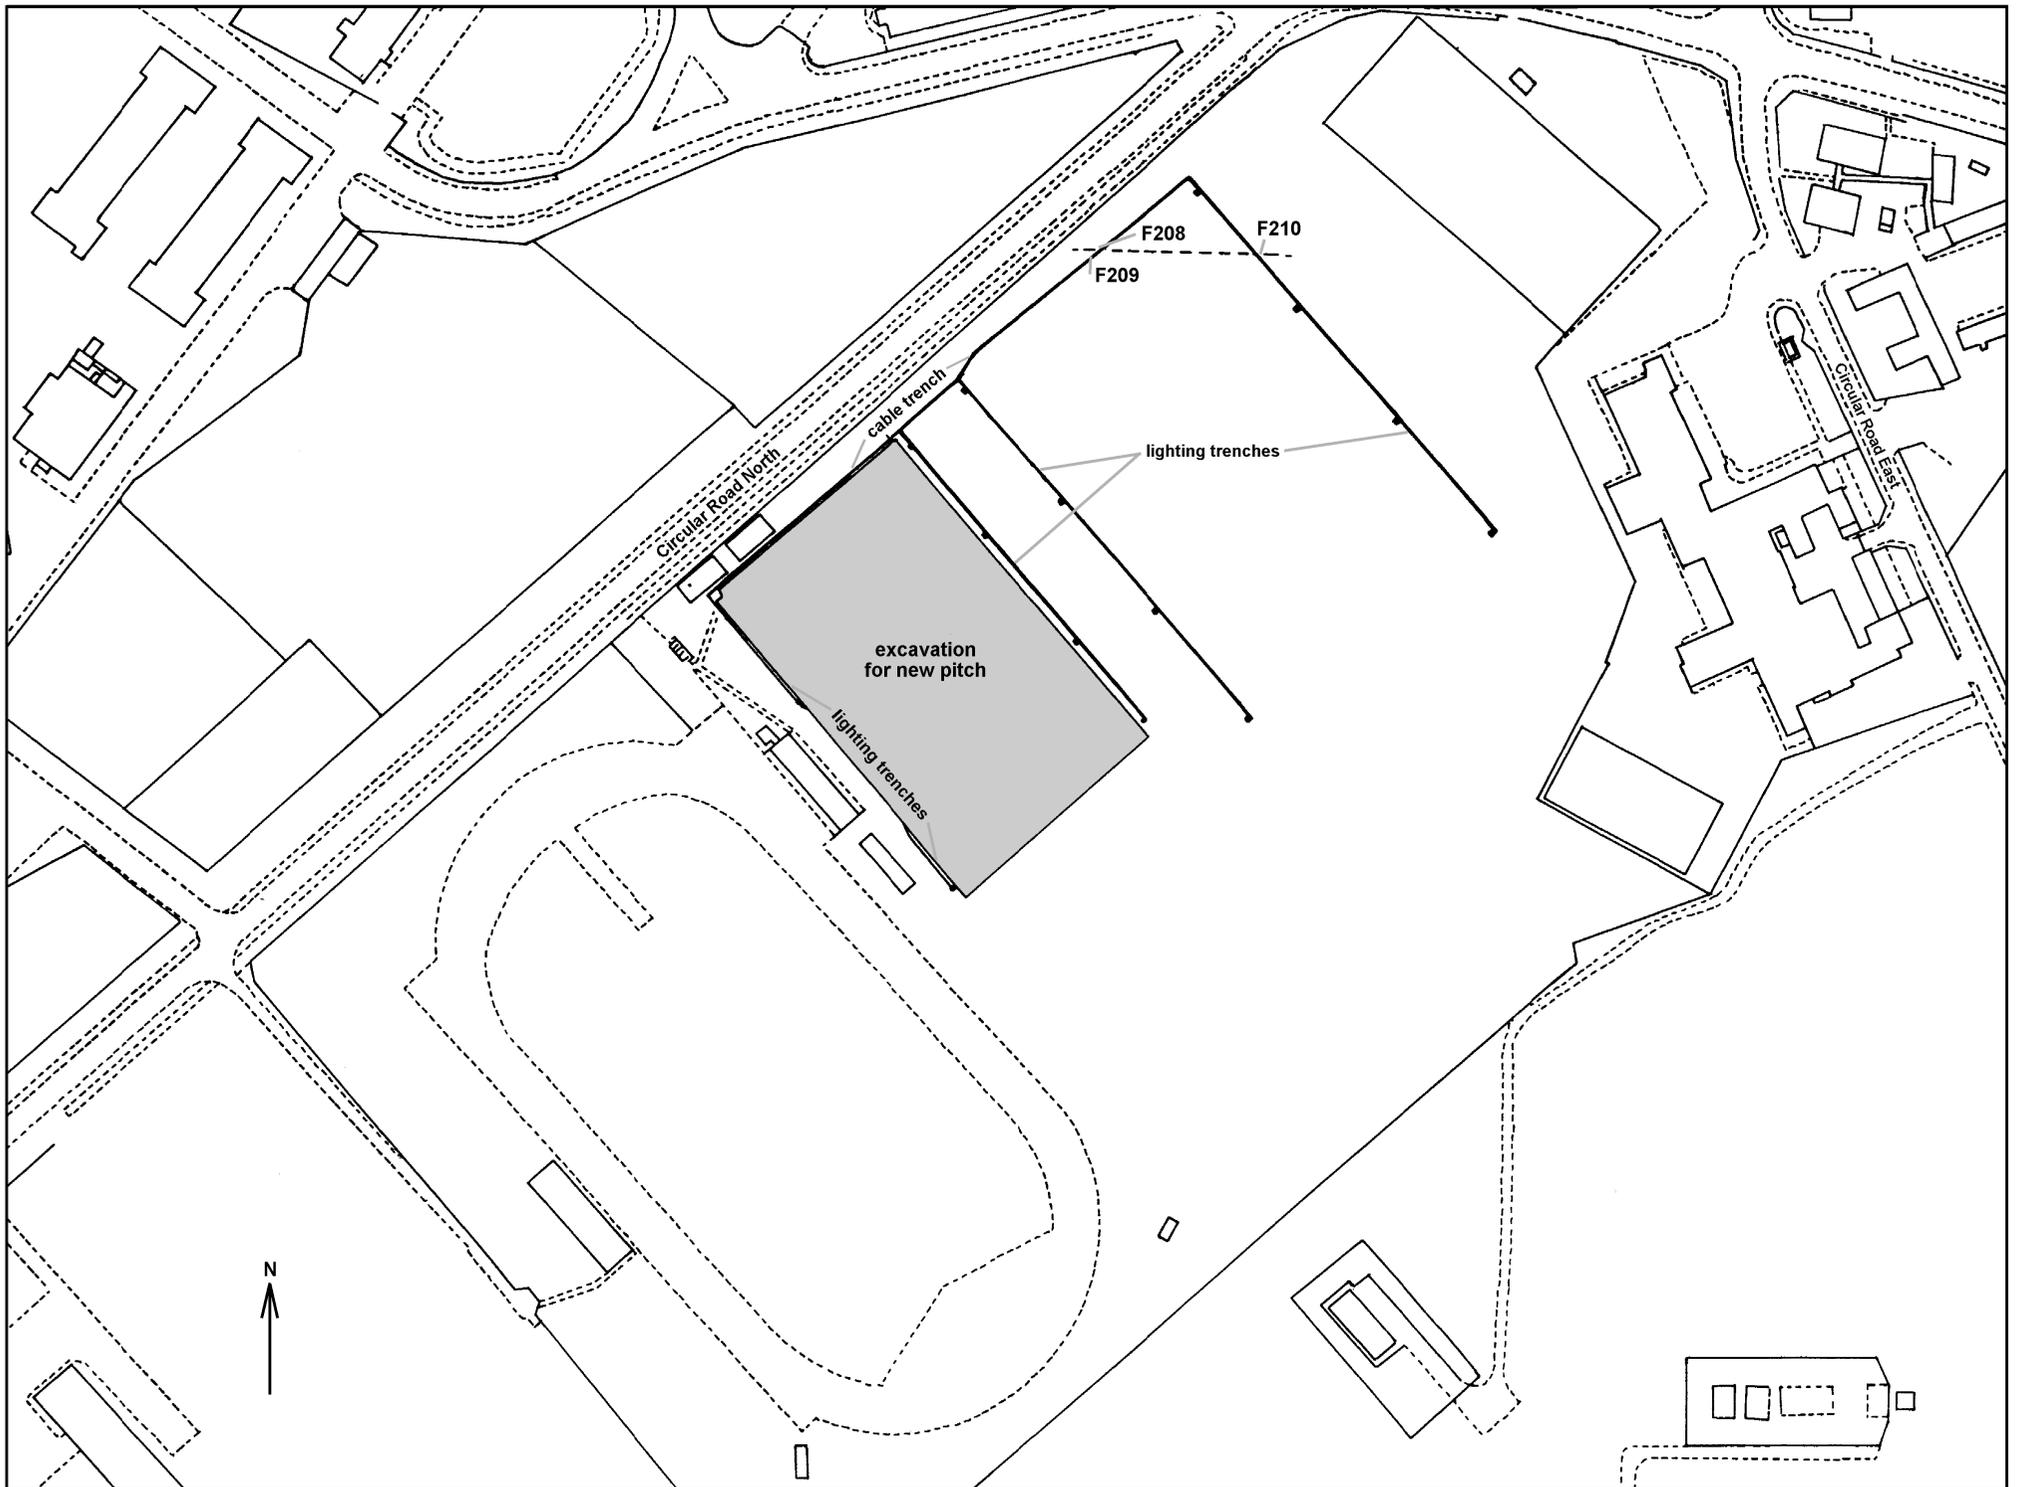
Site location, showing main excavation area and service trenches. Scale 1:1250.
